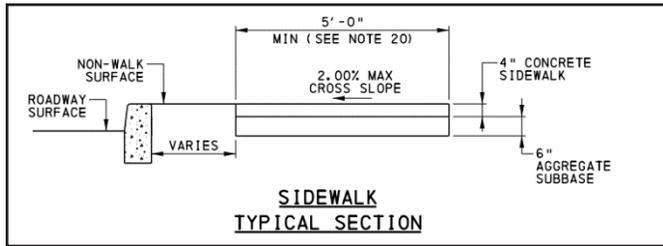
Sidewalk design detail from the PennDOT Roadway Construction Standards, RC-67M manual.
